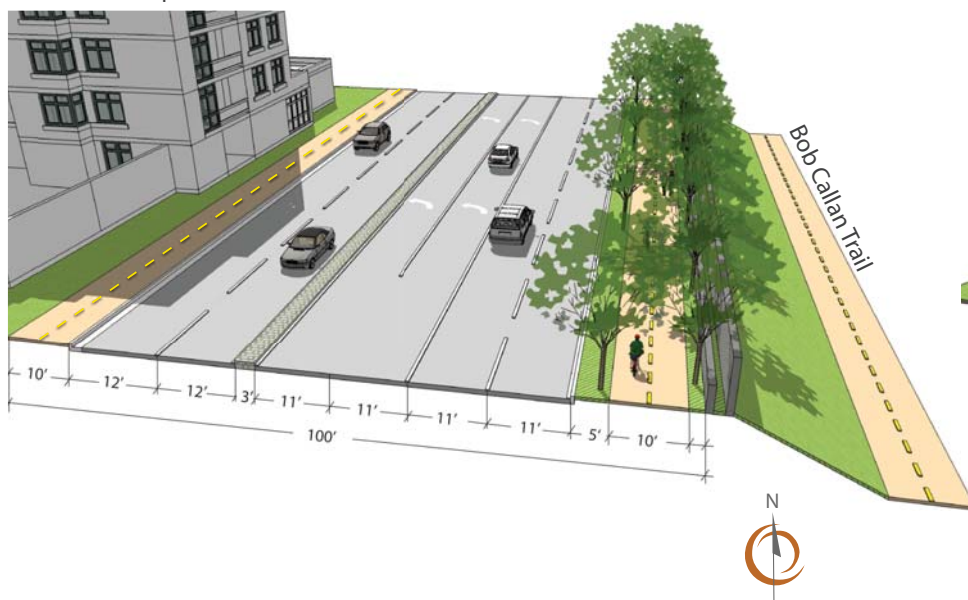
Existing Interstate North Parkway Cross Section - West of Powers Ferry Road
